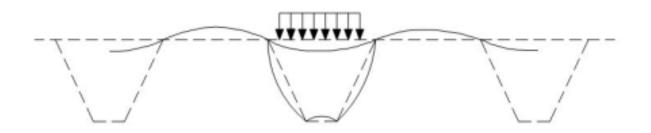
Structural system 1 (Håkansson & Wallerman, 2015)
